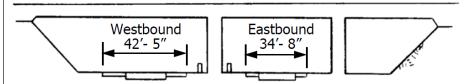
Bridge elevation view of two separate highway features below the bridge.
